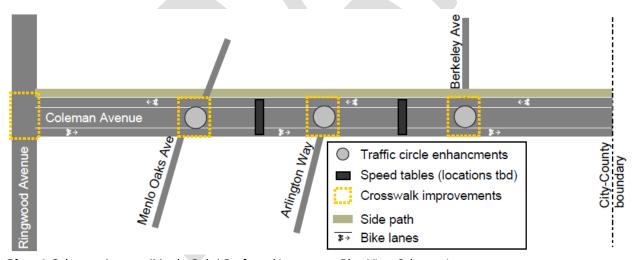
Coleman Avenue (Menlo Oaks) Preferred Long-term Plan View Schematic Bike Lanes with Off-street Pathway
